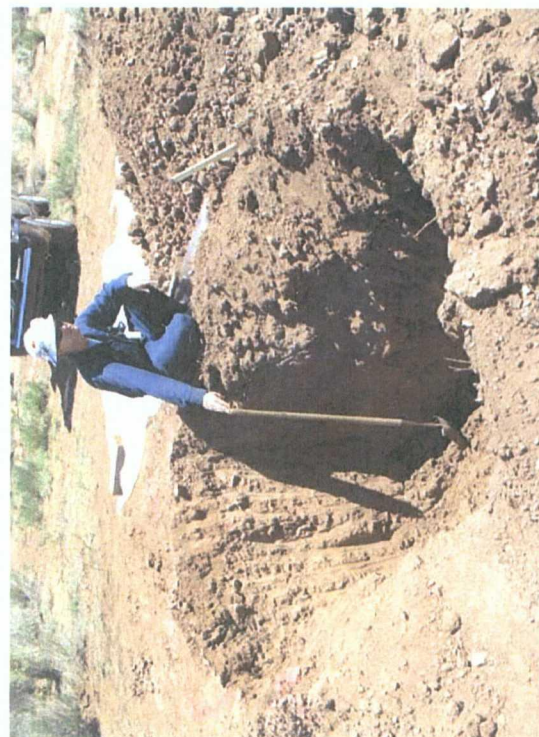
B9 new - Excavated to 5' bgs, shovel in picture is 4' 9"
